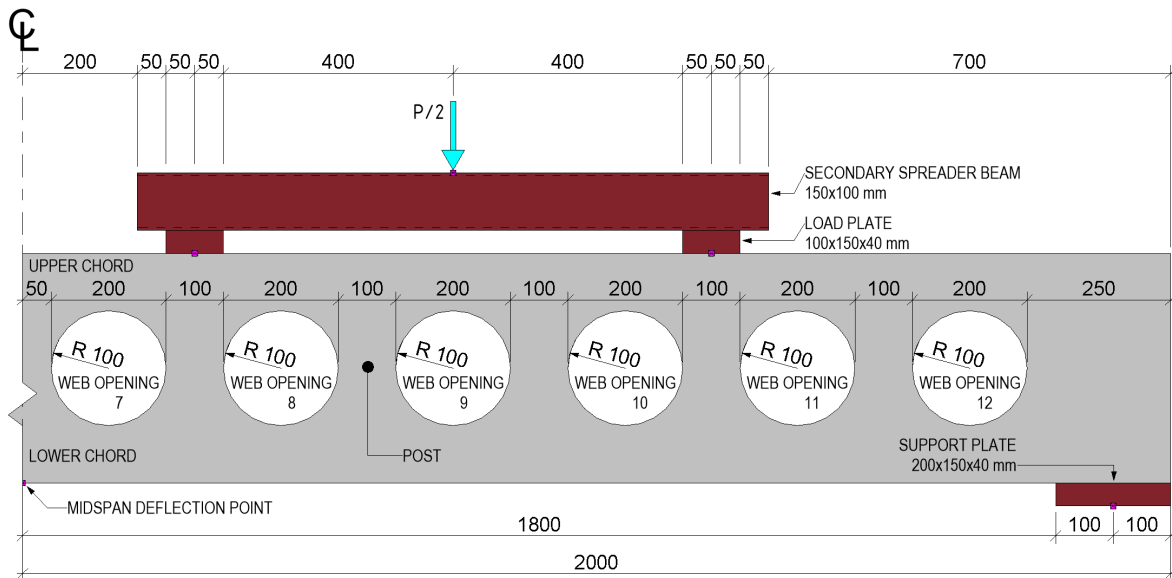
RCxcb. Geometrical dimensions given in mm. Modelling tool [Autodesk Inc., 2018].
